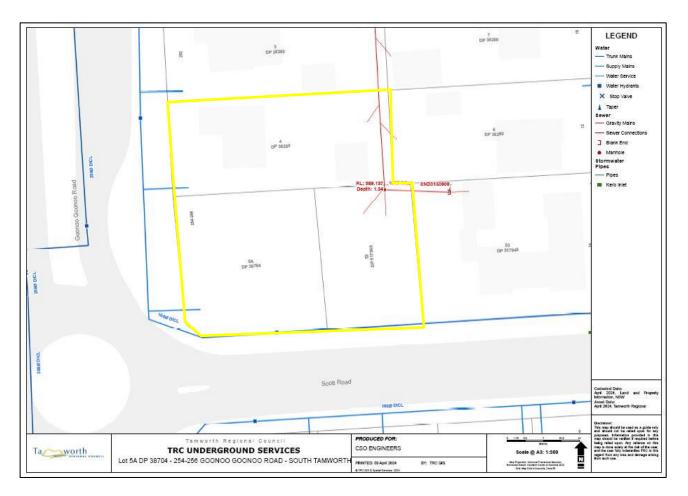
Existing Servicing Infrastructure (Source TRC GIS Service 09/04/2024)
